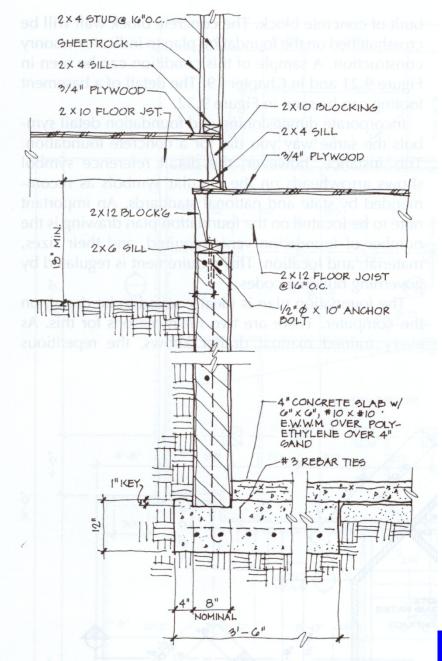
Drafted detail of interior bearing footing with wood floor.
